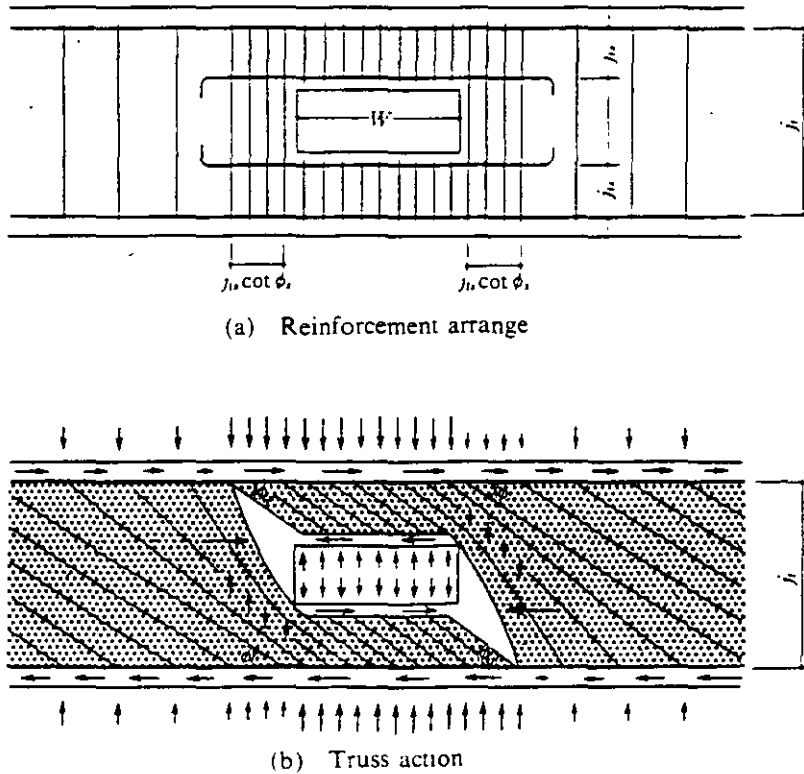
Beam with a rectangular opening reinforced by the longitudinal reinforcement and stirrups in sub-beams.
